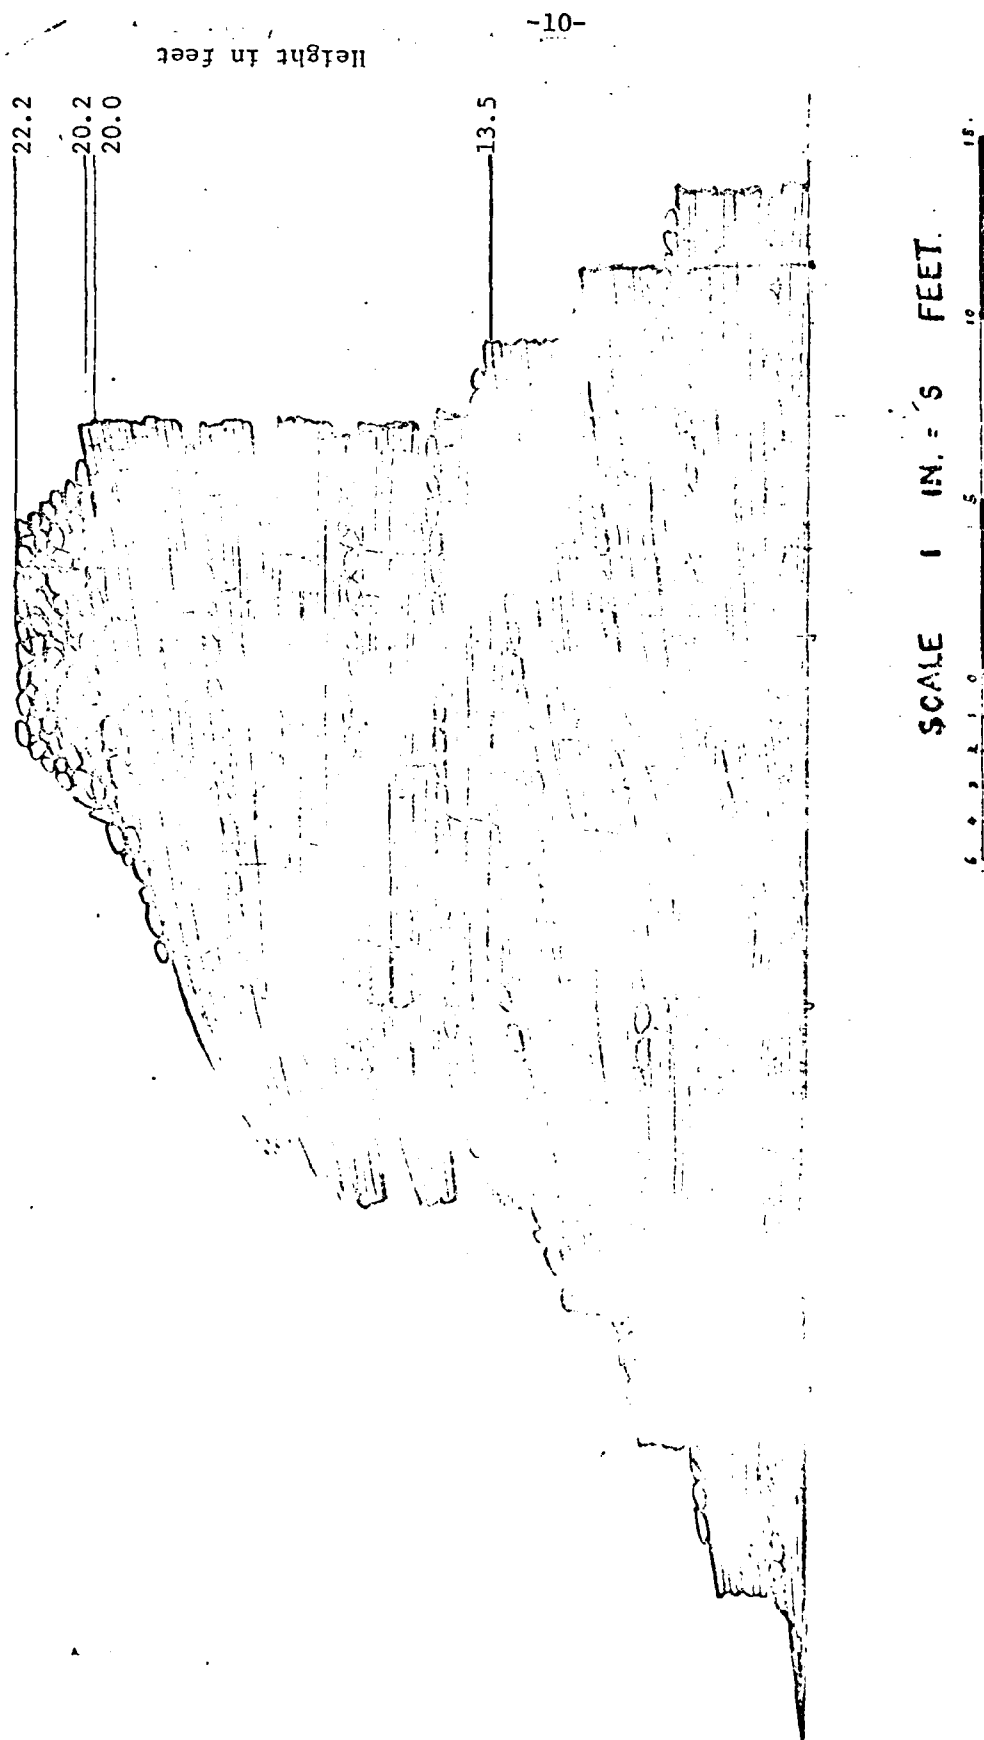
Cross Sections of Rock and Brush Wing Dams
